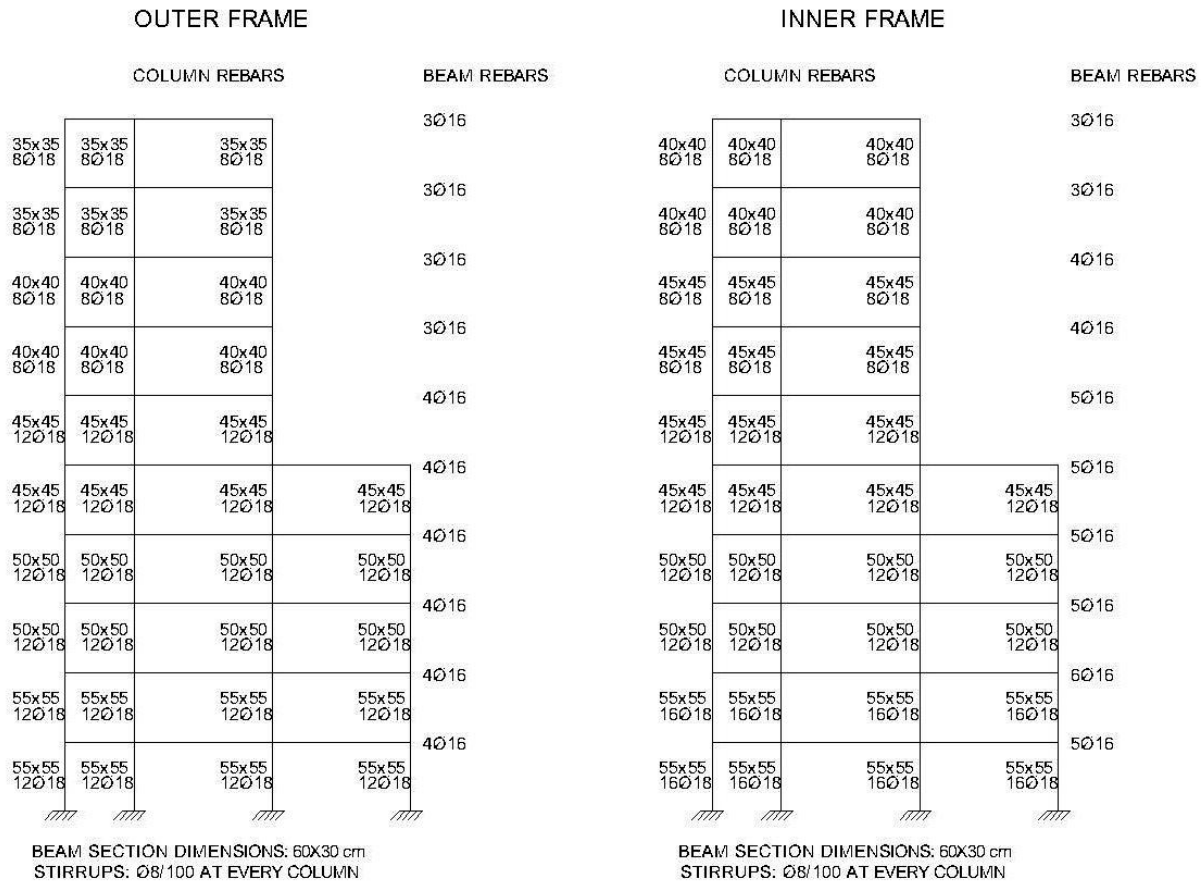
Section dimensions and detailing of the Ten-Storey Setback Frame D with Unequal External Bay length.
